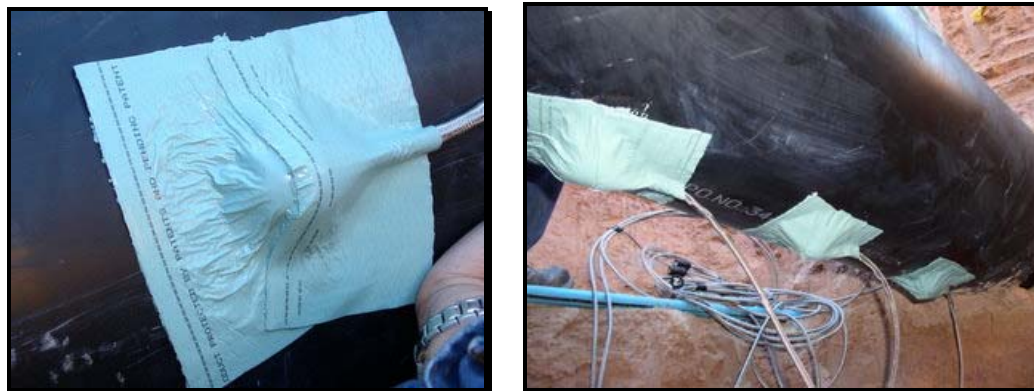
Mold paste under cable, keeping it parallel to the pipe.
